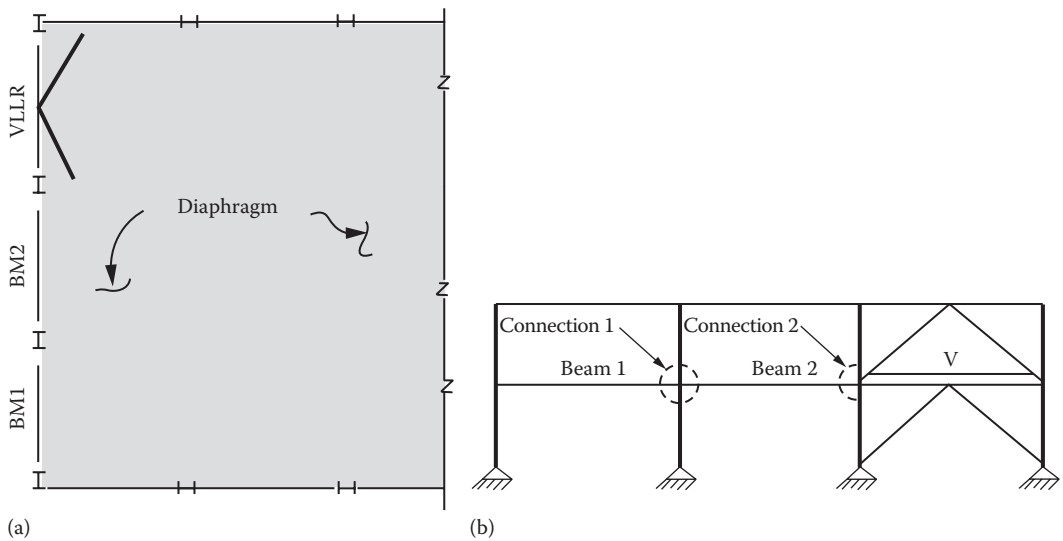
Diaphragm design procedures, approach 1: (a) partial plan of diaphragm and (b) elevation. *Note:* In this method, the entire diaphragm shear is transferred directly to the VLLRS. Connections 1 and 2 or beams 1 and 2 need not be designed for diaphragm forces.
